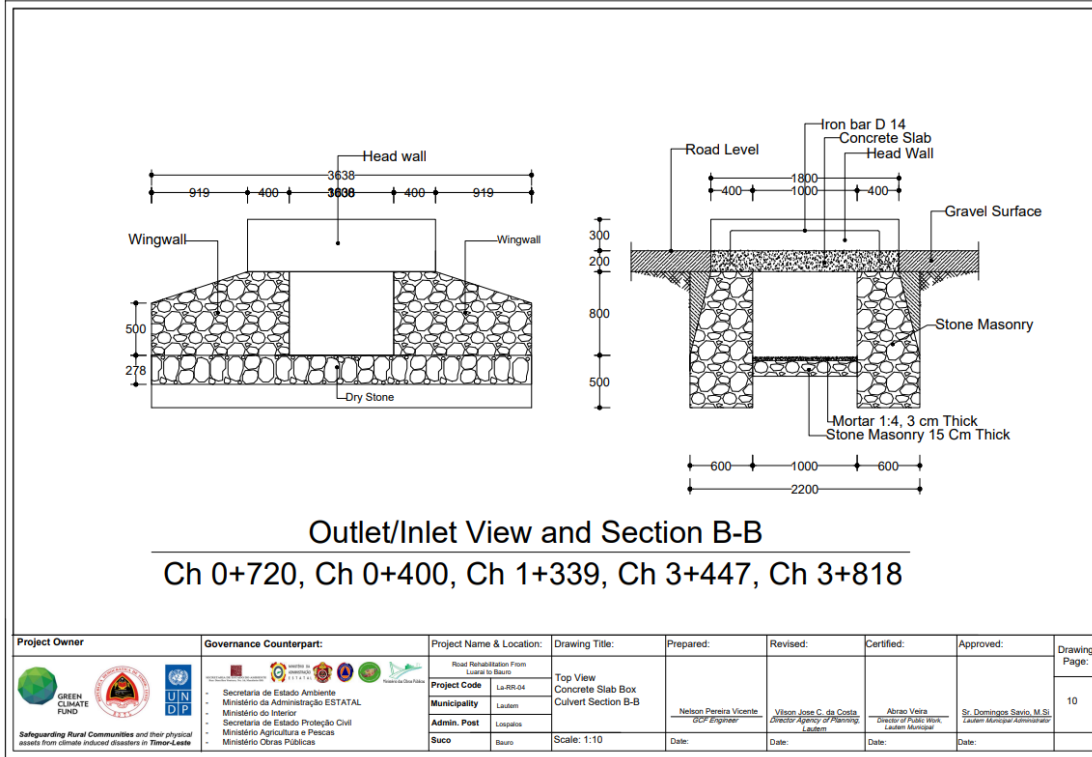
a): Reinforced Concrete (Single) Box Culvert
